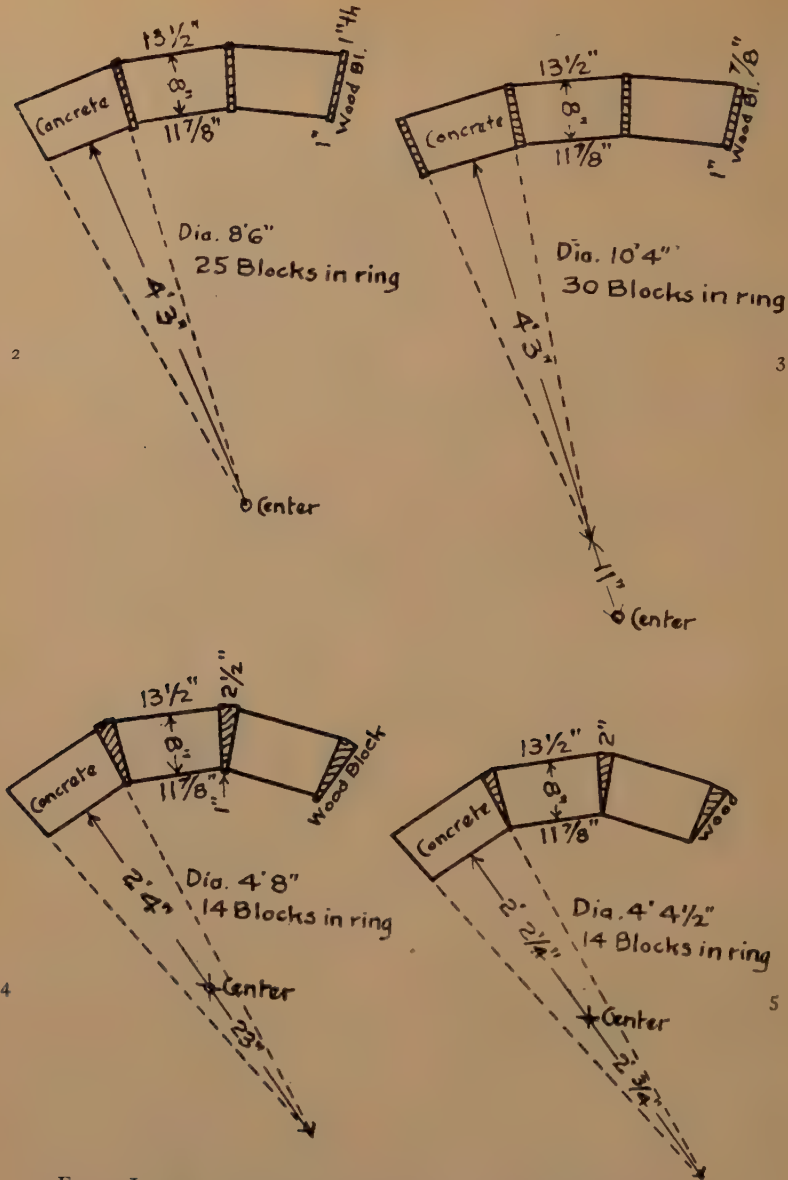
LAYOUT OF CONCRETE BLOCKS FOR 8 FT 6 IN. DIAM GALLERY.
